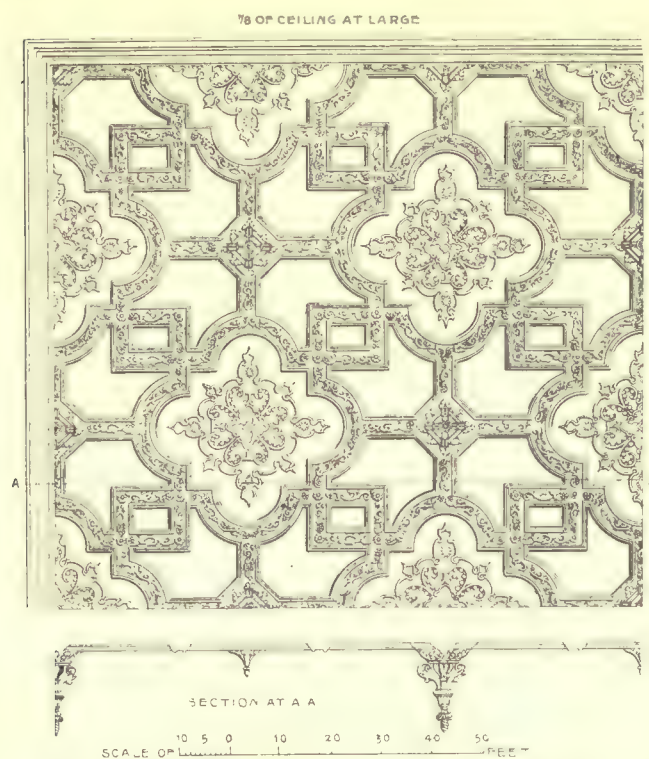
Drawing-room Ceiling at Hatfield House.
